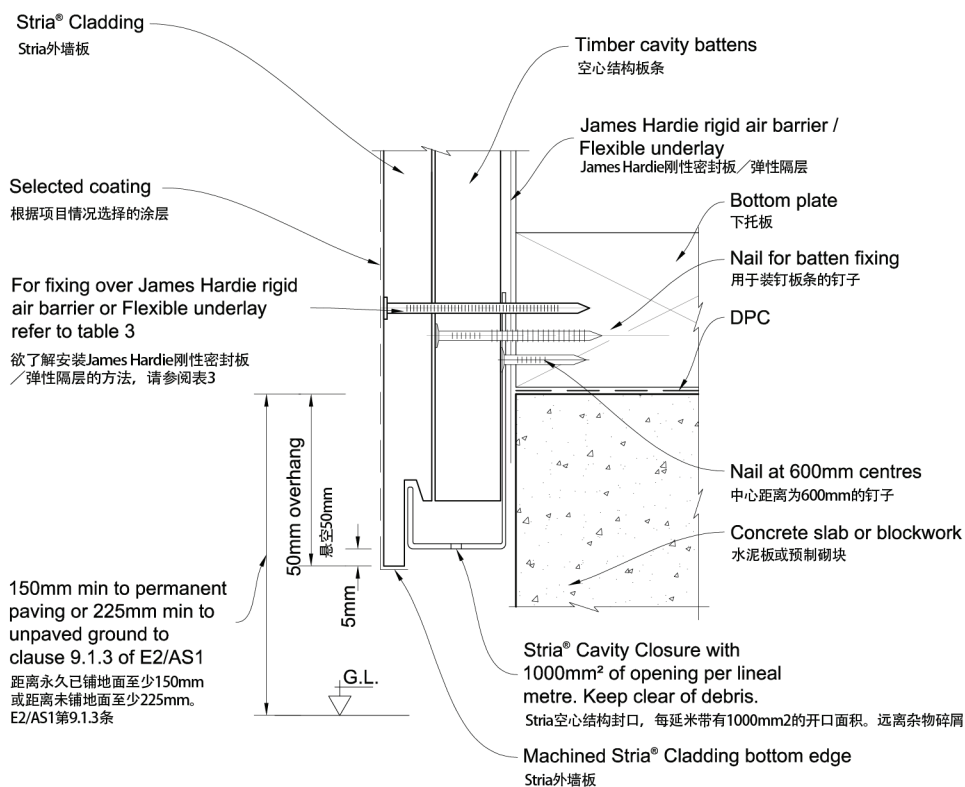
Foundation detail – option 2 图5: 地基详图 – 方案2
